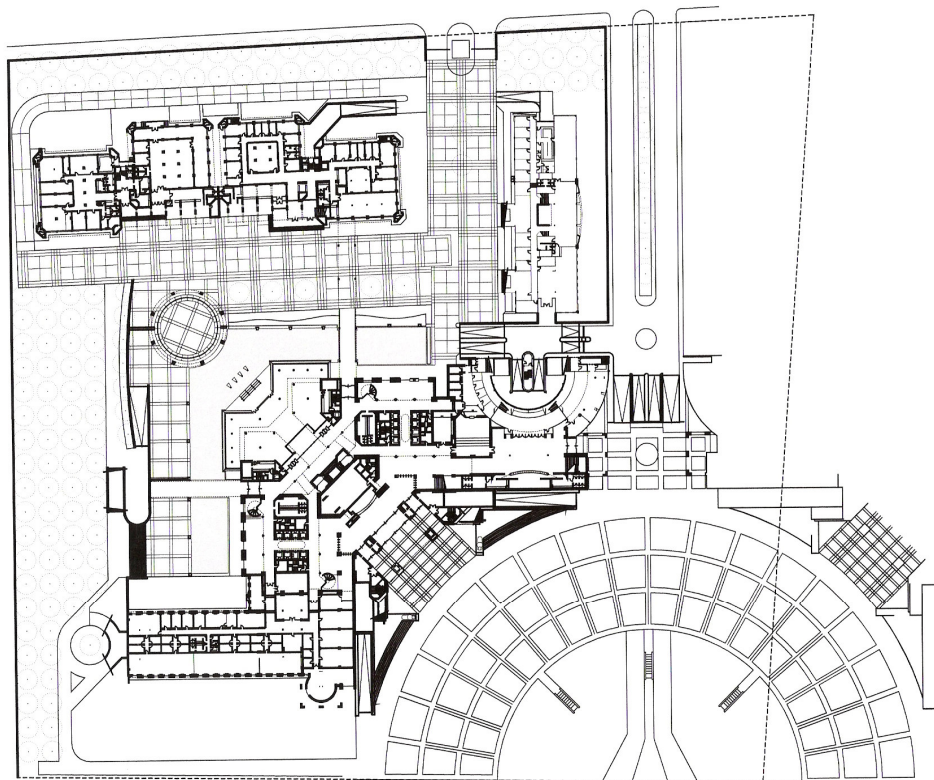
Entrance floor plan of the third project (Source: Sute Architectural Office Archive)
